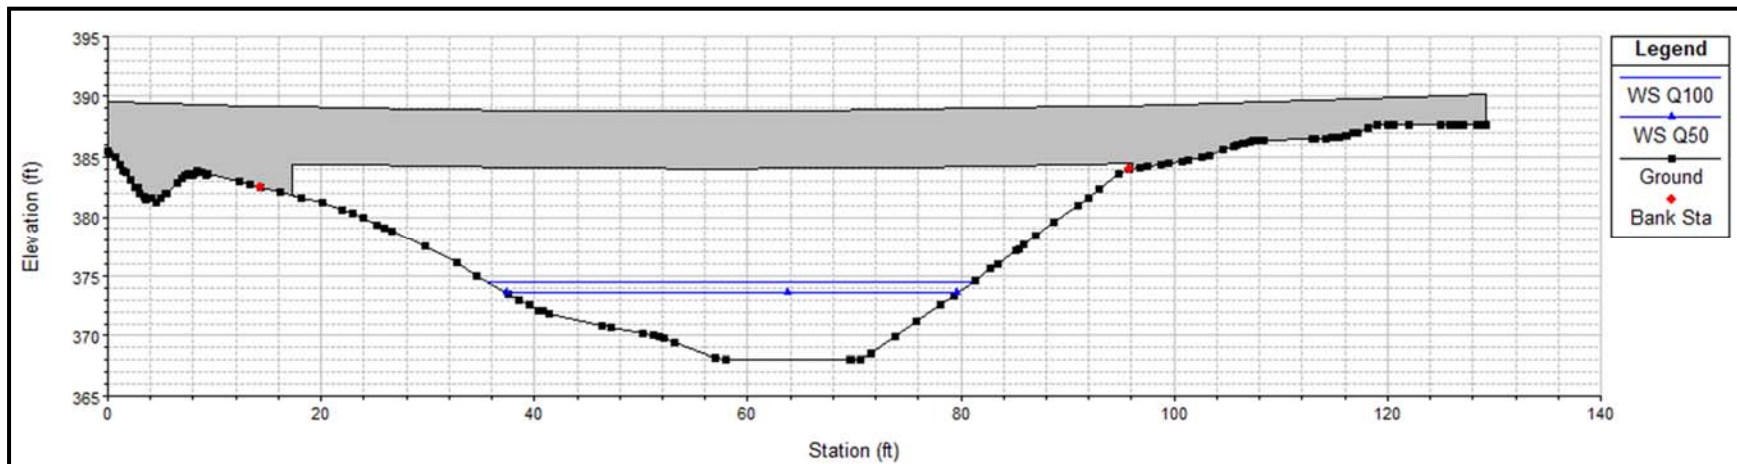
Upstream Face of Proposed Bridge, Looking Downstream (Northeast)
